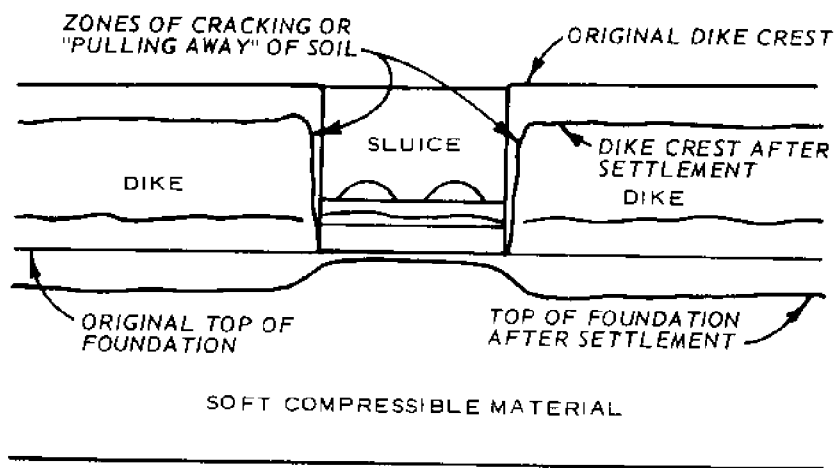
Cracking at Dike-Structure Junction Caused By Differential Settlement Due to Dike Load on Foundation Being Greater Than Sluice Load
